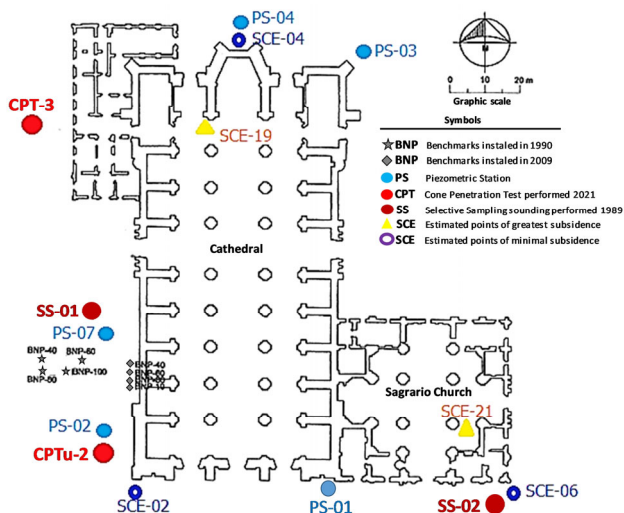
Location plan of piezometric stations, benchmarks, and geotechnical soundings.
